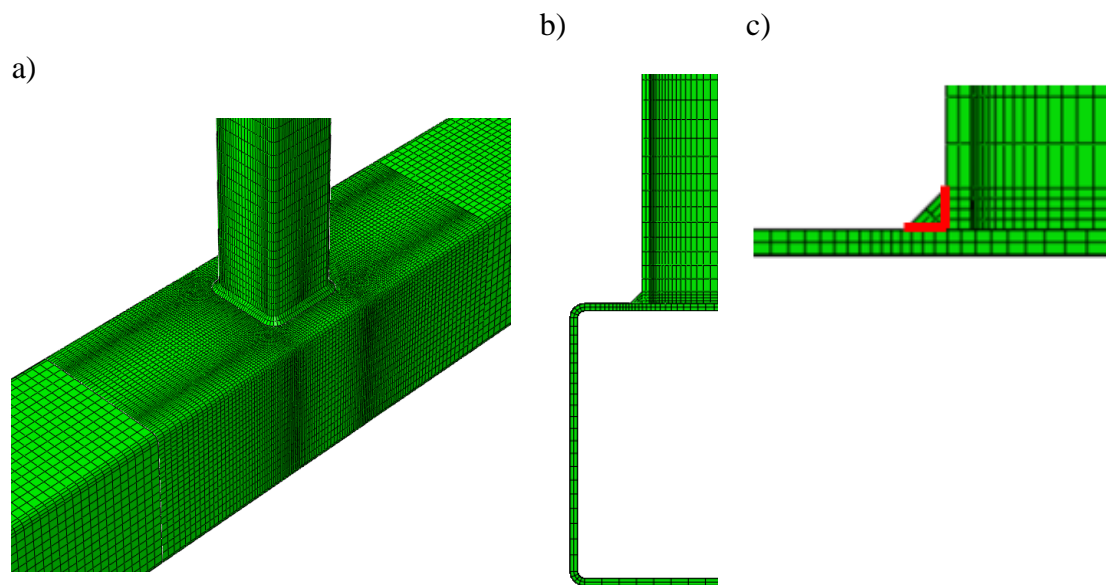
Finite element model of the tubular T-joint: a) overall view; b) cut through cross-section; c) tie constrain between weld and SHS sections.
